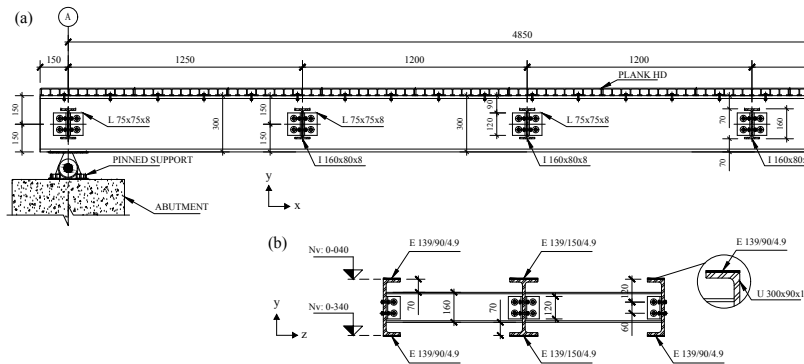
FRP footbridge drawings: (a) Side view , and (b) Cross-section. Dimensions in mm.
